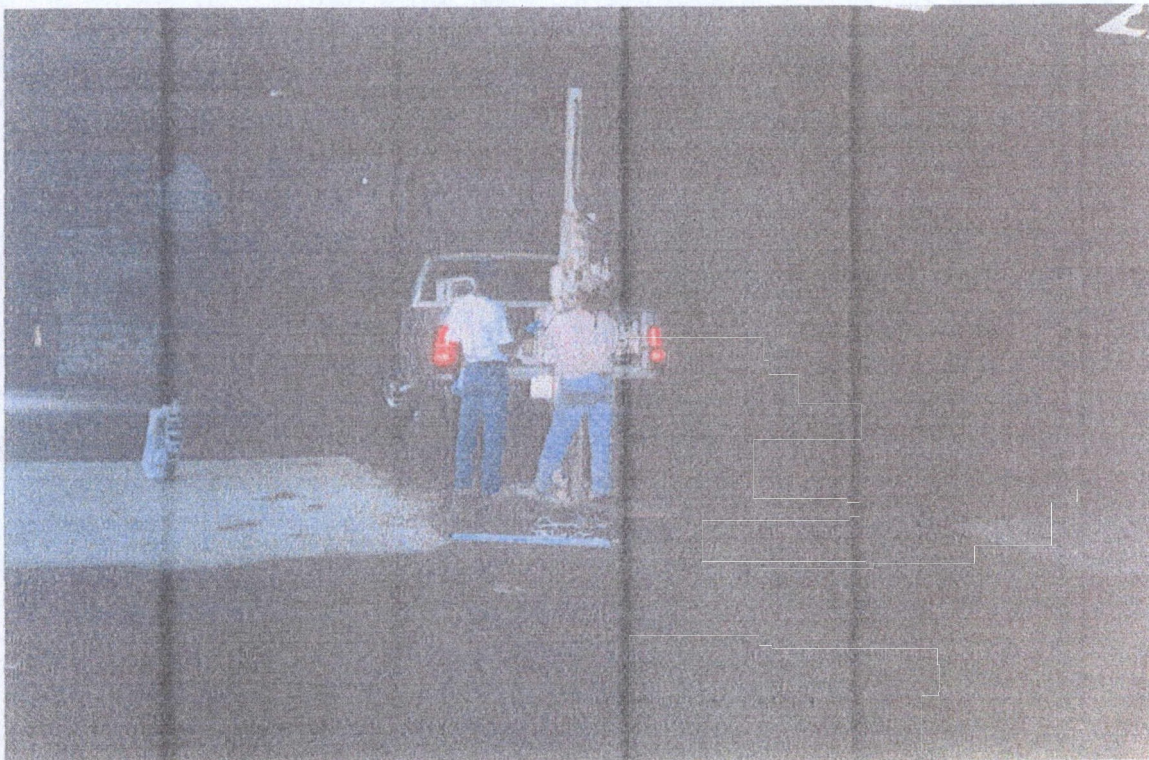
Installation of Boring B-2 inside forge building. View facing south. Former pit is visible to left of Geoprobe, where lighter concrete surface is visible.
